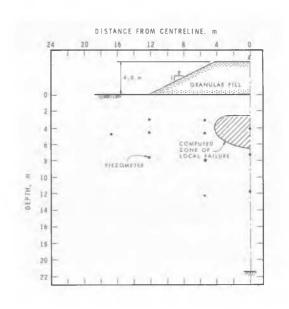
Zone of Local Failure Under the 4.0 m High Boundary Road Embankment
